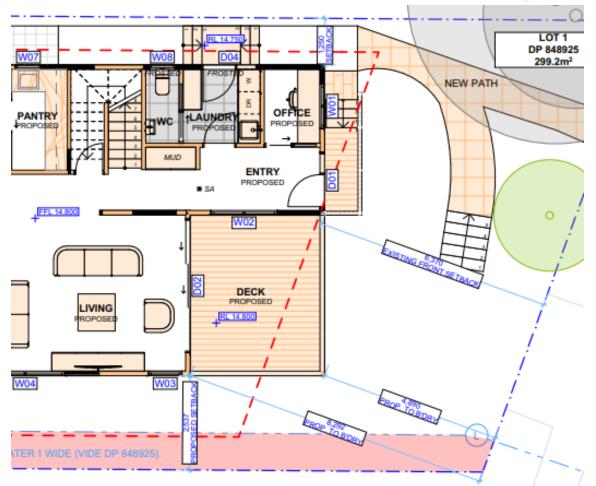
Excerpt from Architectural Drawing DA08 Proposed Ground Floor Plan Illustrating the proposed front setback to the reconfigured front deck
